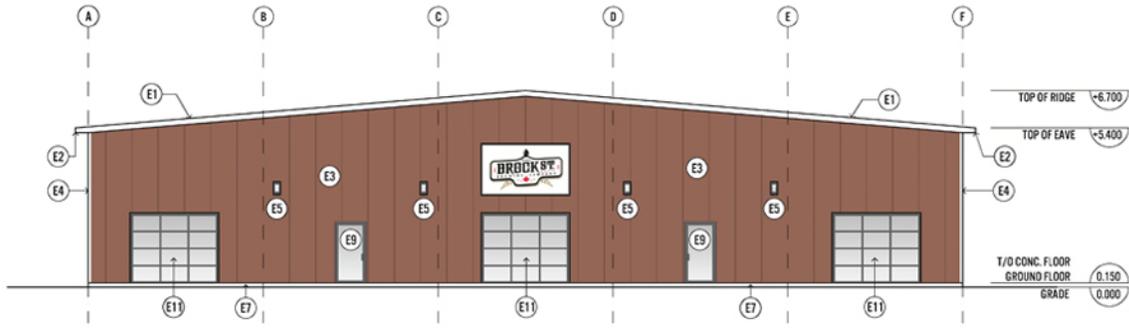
Phase 1 - West Elevation Fronting Wilmott Street
